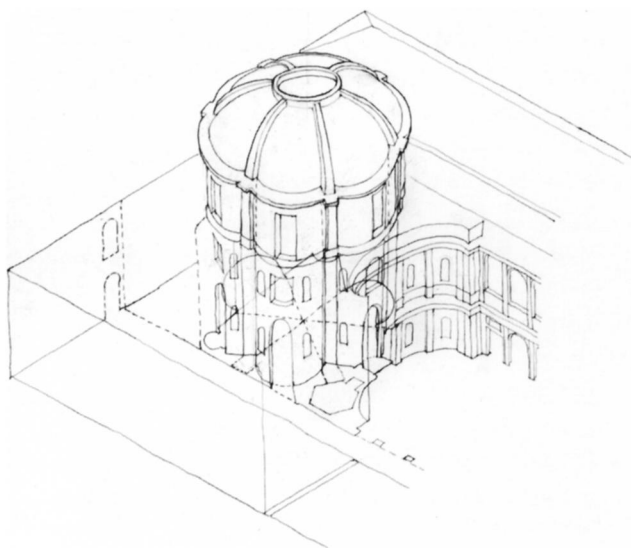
Isometric of structure and interior, drum, and roof as built, 1643-1645
